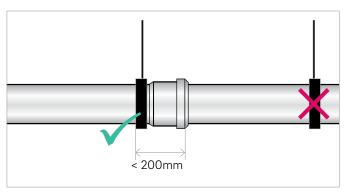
Correct fixed bracket location behind pipe sockets
